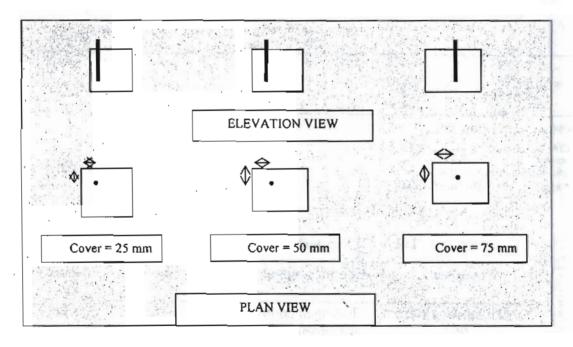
b) Thickness of concrete cover used with concrete cubic samples
